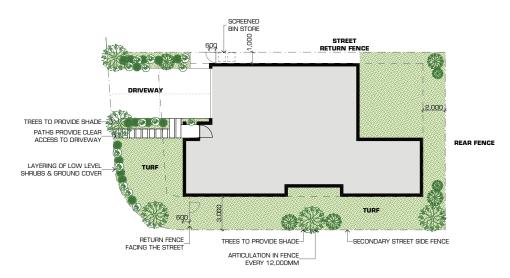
Typical Frontage Landscape for Corner Lots - Option 1
